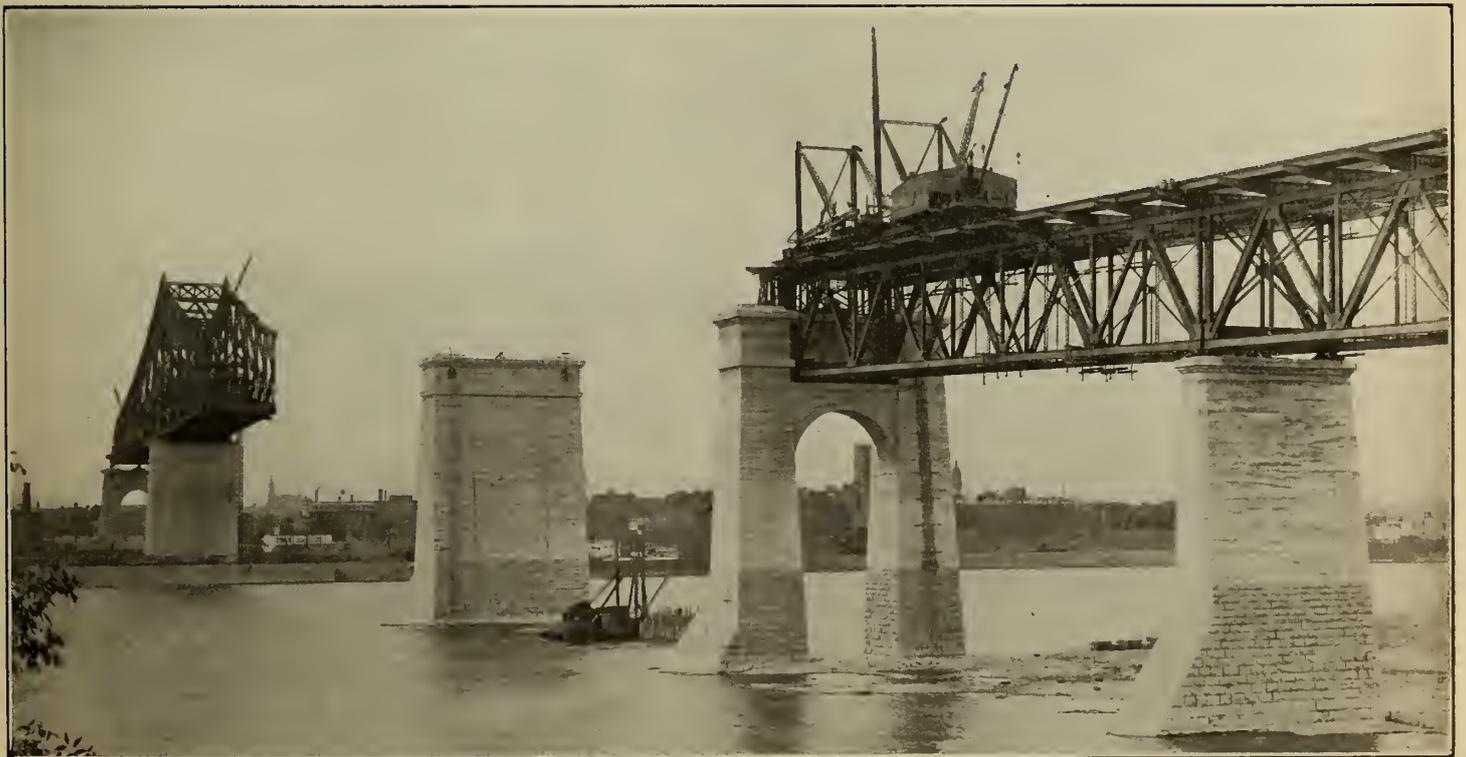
Main Span, South Side—Traveller No. 8 being set up on South Approach. Temporary Piers at AL⁷ under Construction. Progress as at June 22nd, 1928.
